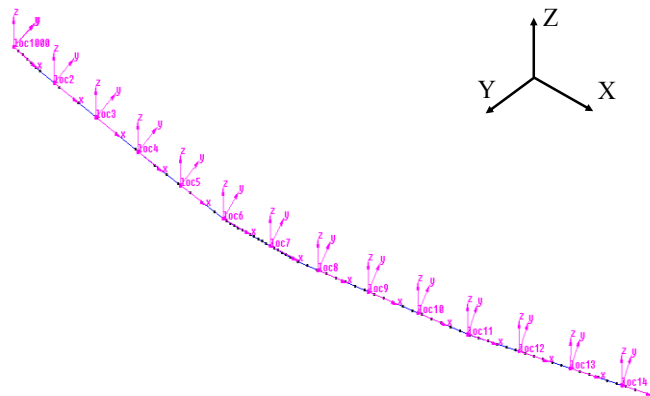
Construction of freeway's centreline, pier locations and local axis for each pier location.
